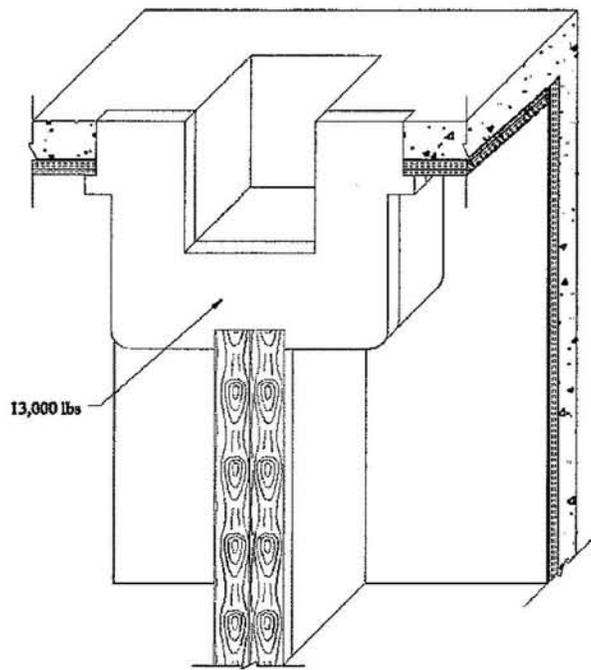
TYPICAL BEAM POCKET DETAIL
